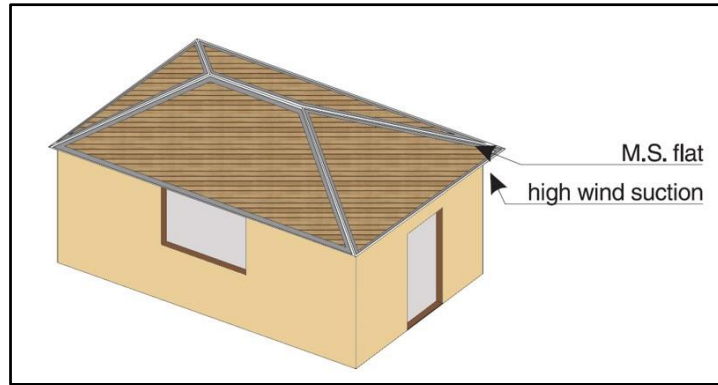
(C) ISA 50 mm × 50 mm × 3 mm SHOULD BE PROVIDED TO REINFORCE TOP ROOF JOINTS IN HIGH SUCTION ZONES
